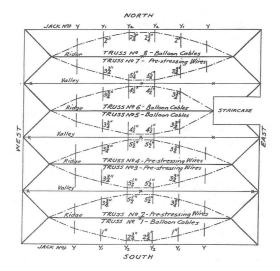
Thomas Linacre School, Wigan. Plan of prestressed steel roof over the workshops
